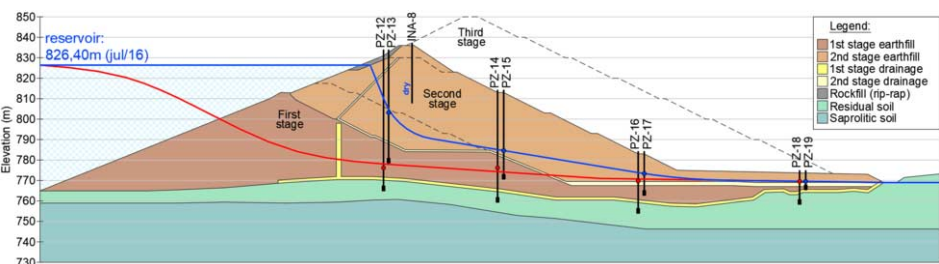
Cross-section with piezometric levels interpreted for the foundation and the embankment [27].
